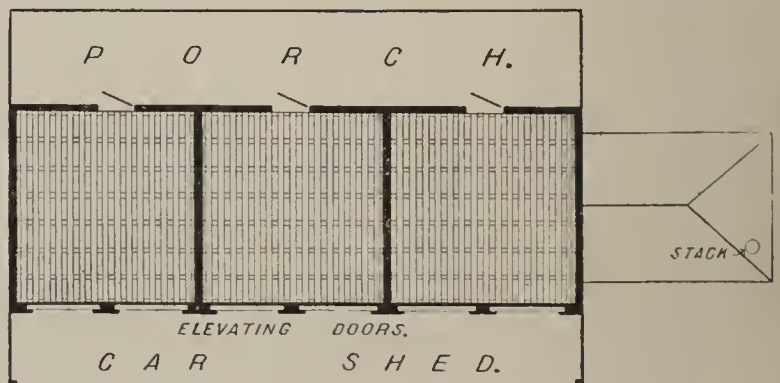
Plan of second or drying floor of air-blast kiln.
